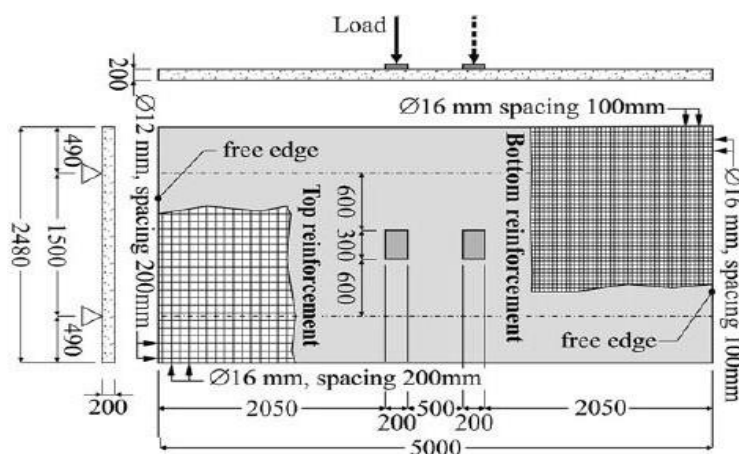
Specimen dimension, reinforcement and loading setup [5]
